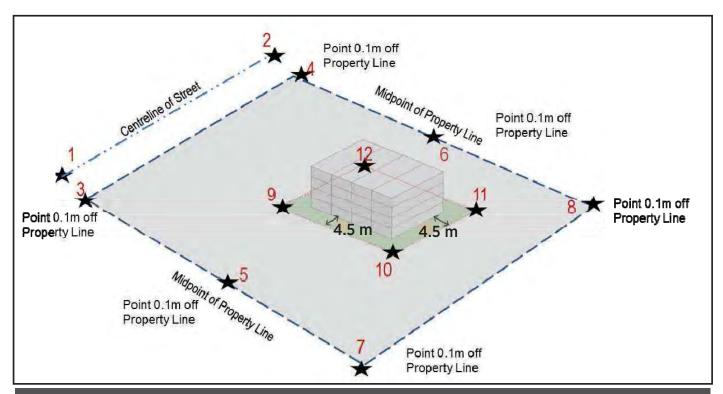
Context Grade: The average of 12 Points. 8 of which are around the perimeter of the site and 4 points located 4.5 m around each building
